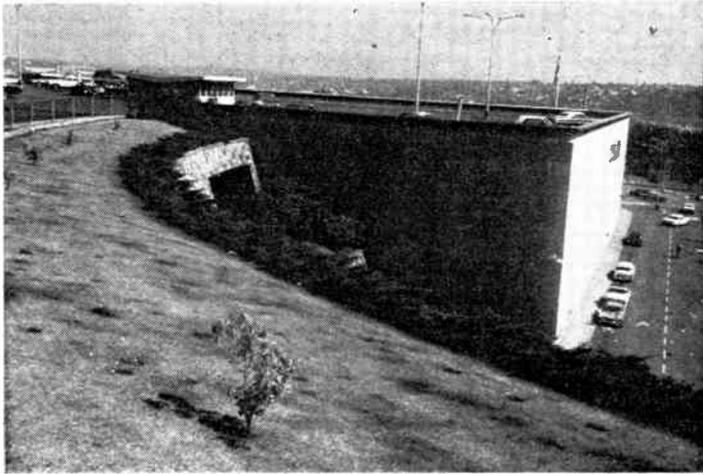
View from rooftop parking access road shows the steep embankment that posed major problems in esthetic site grading and seismic structural design at the Brentwood Shopping Centre near Vancouver, B.C.
